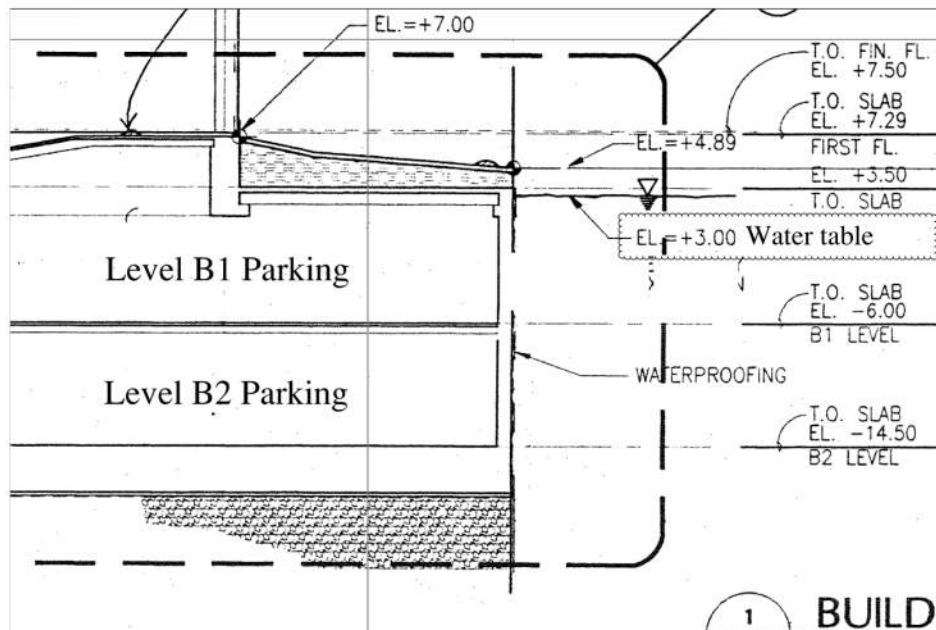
Section Cut of Existing Structure and Water Table - for reference only
